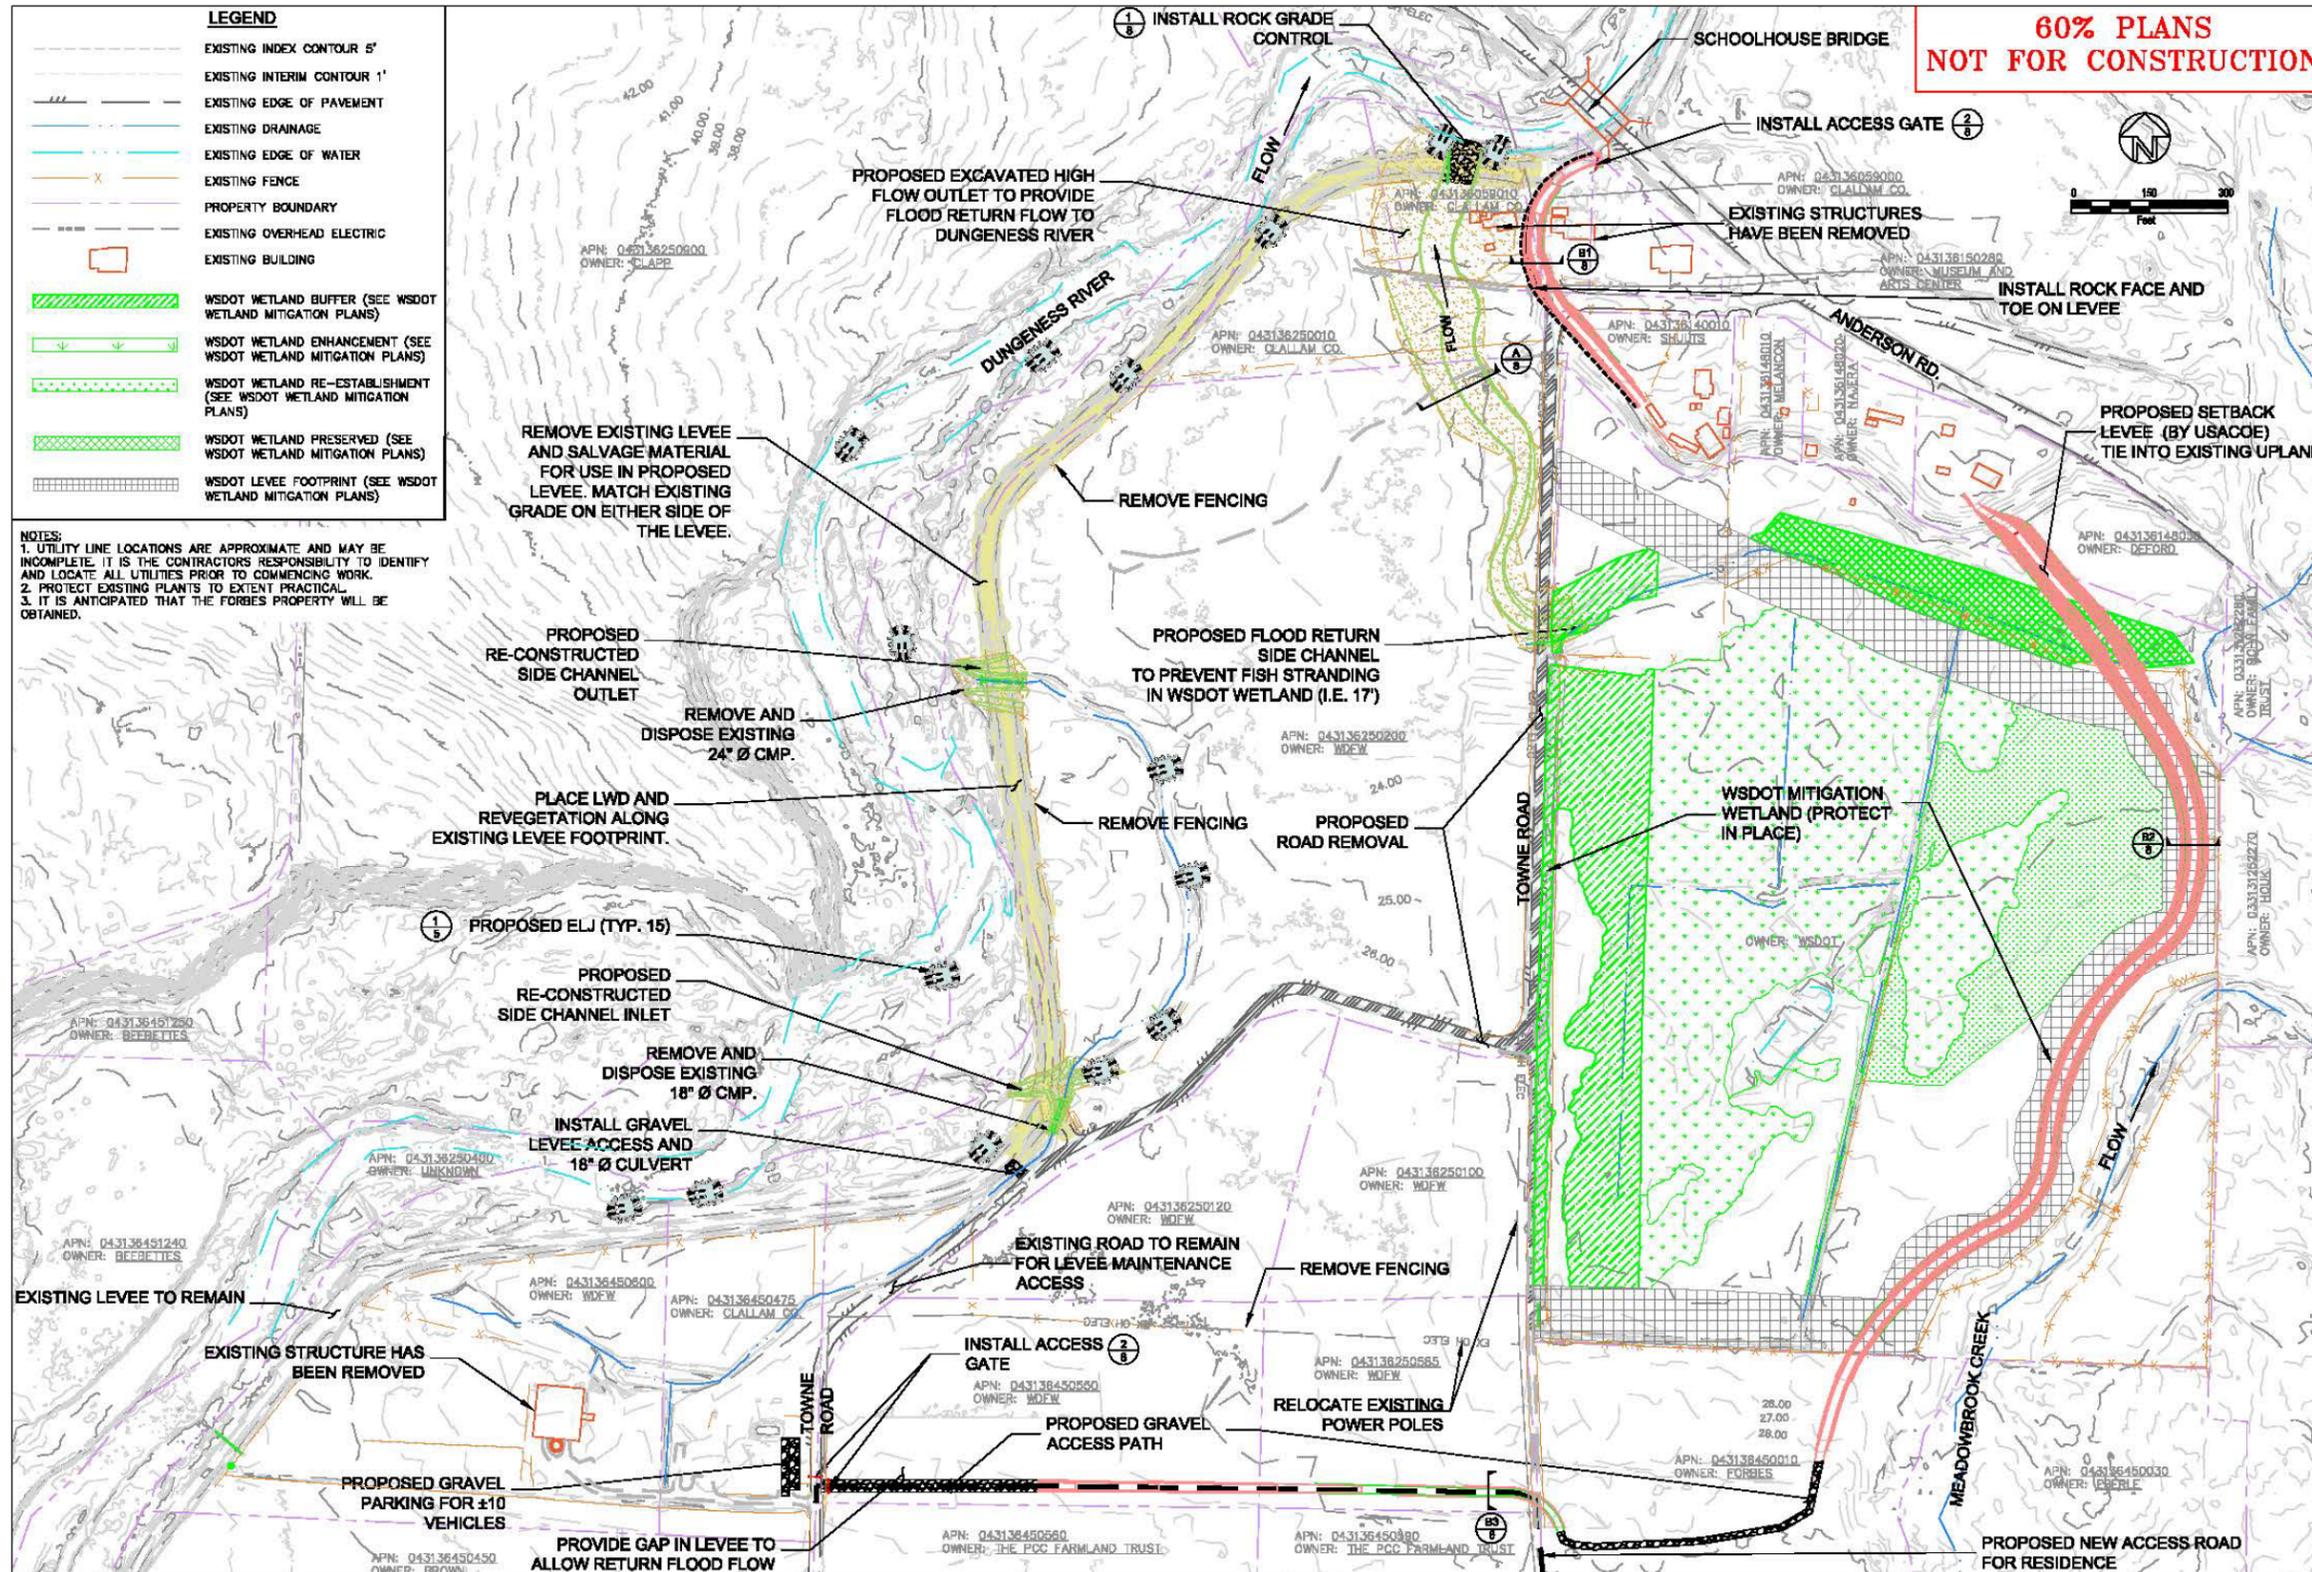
Proposed 60% Setback Levee and Habitat Restoration Plan.
